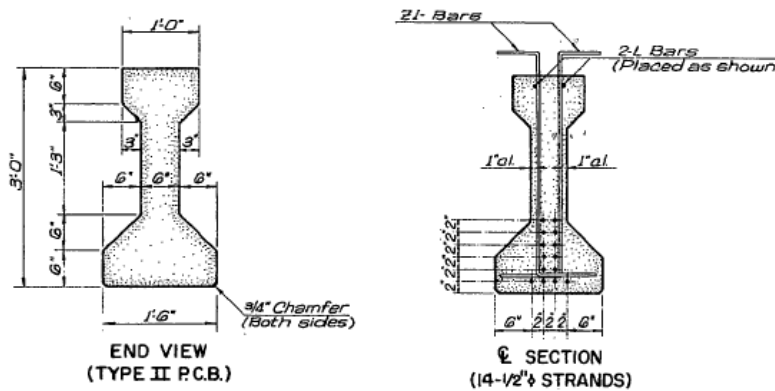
Cross Section of AASHTO Type 2 I-Girder
